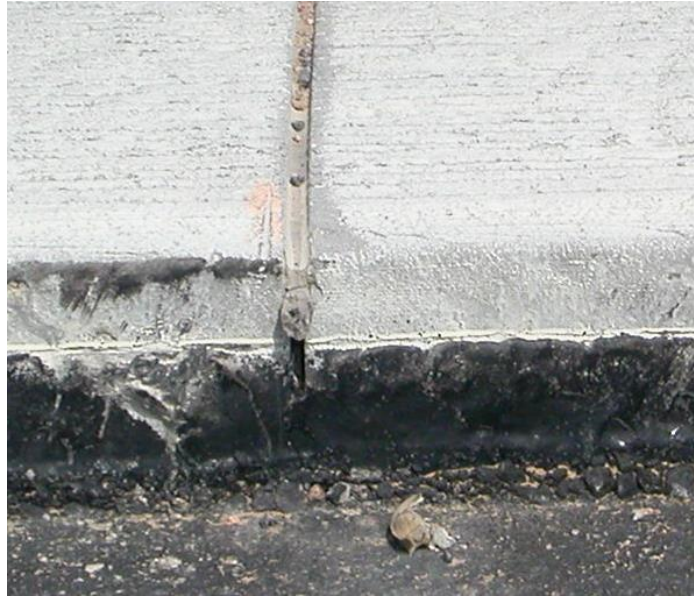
Cross-section of typical Mohave Bypass joint section
